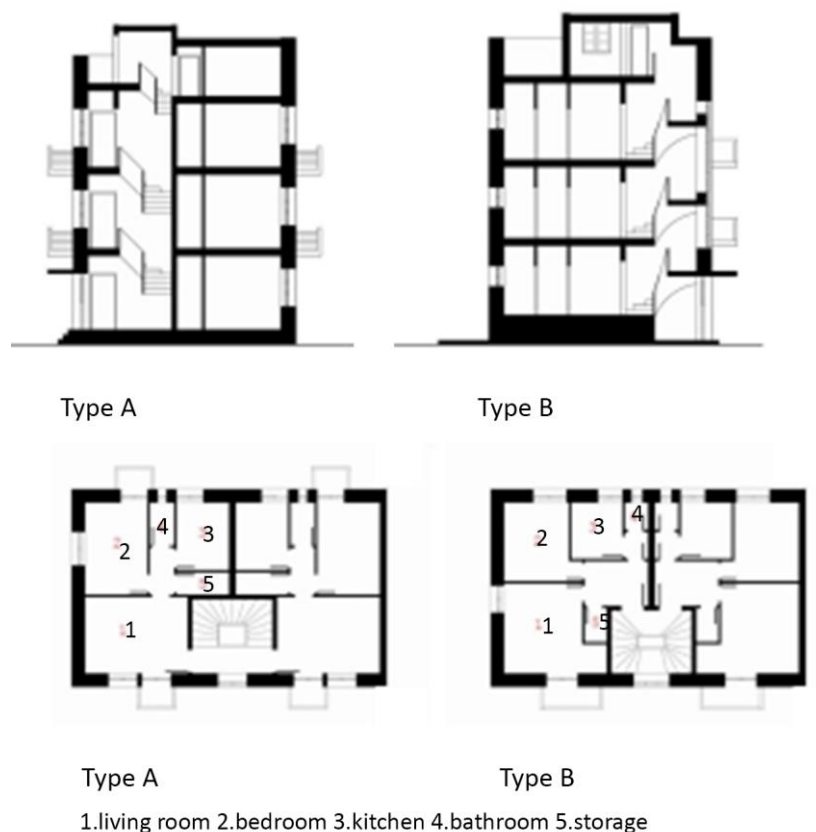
Sections and floor plans of the two apartment types to be found in the complex.
